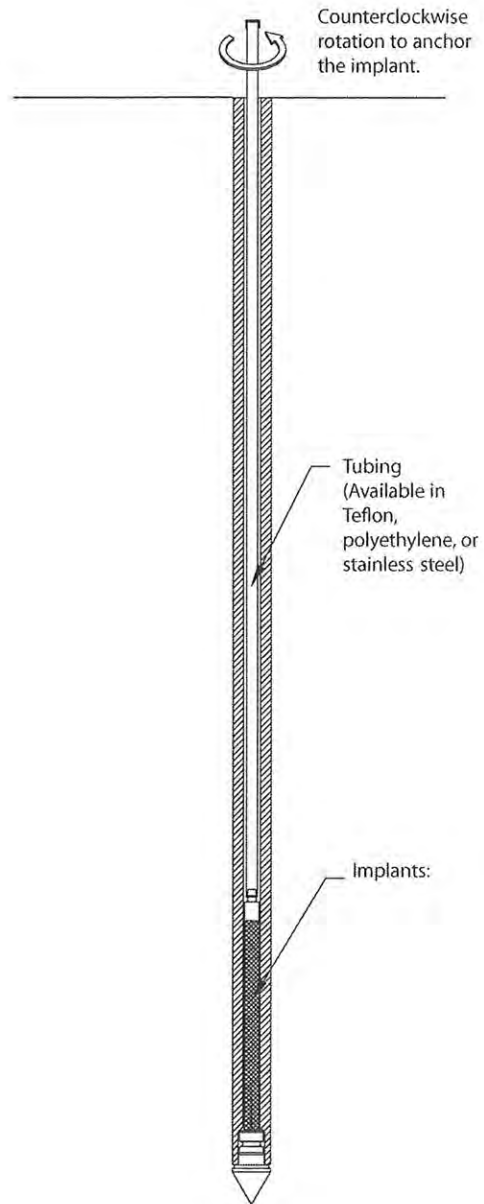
Once depth is achieved, the selected implant and tubing are inserted through the rods. The tubing is rotated to lock the implant into the drive point.
